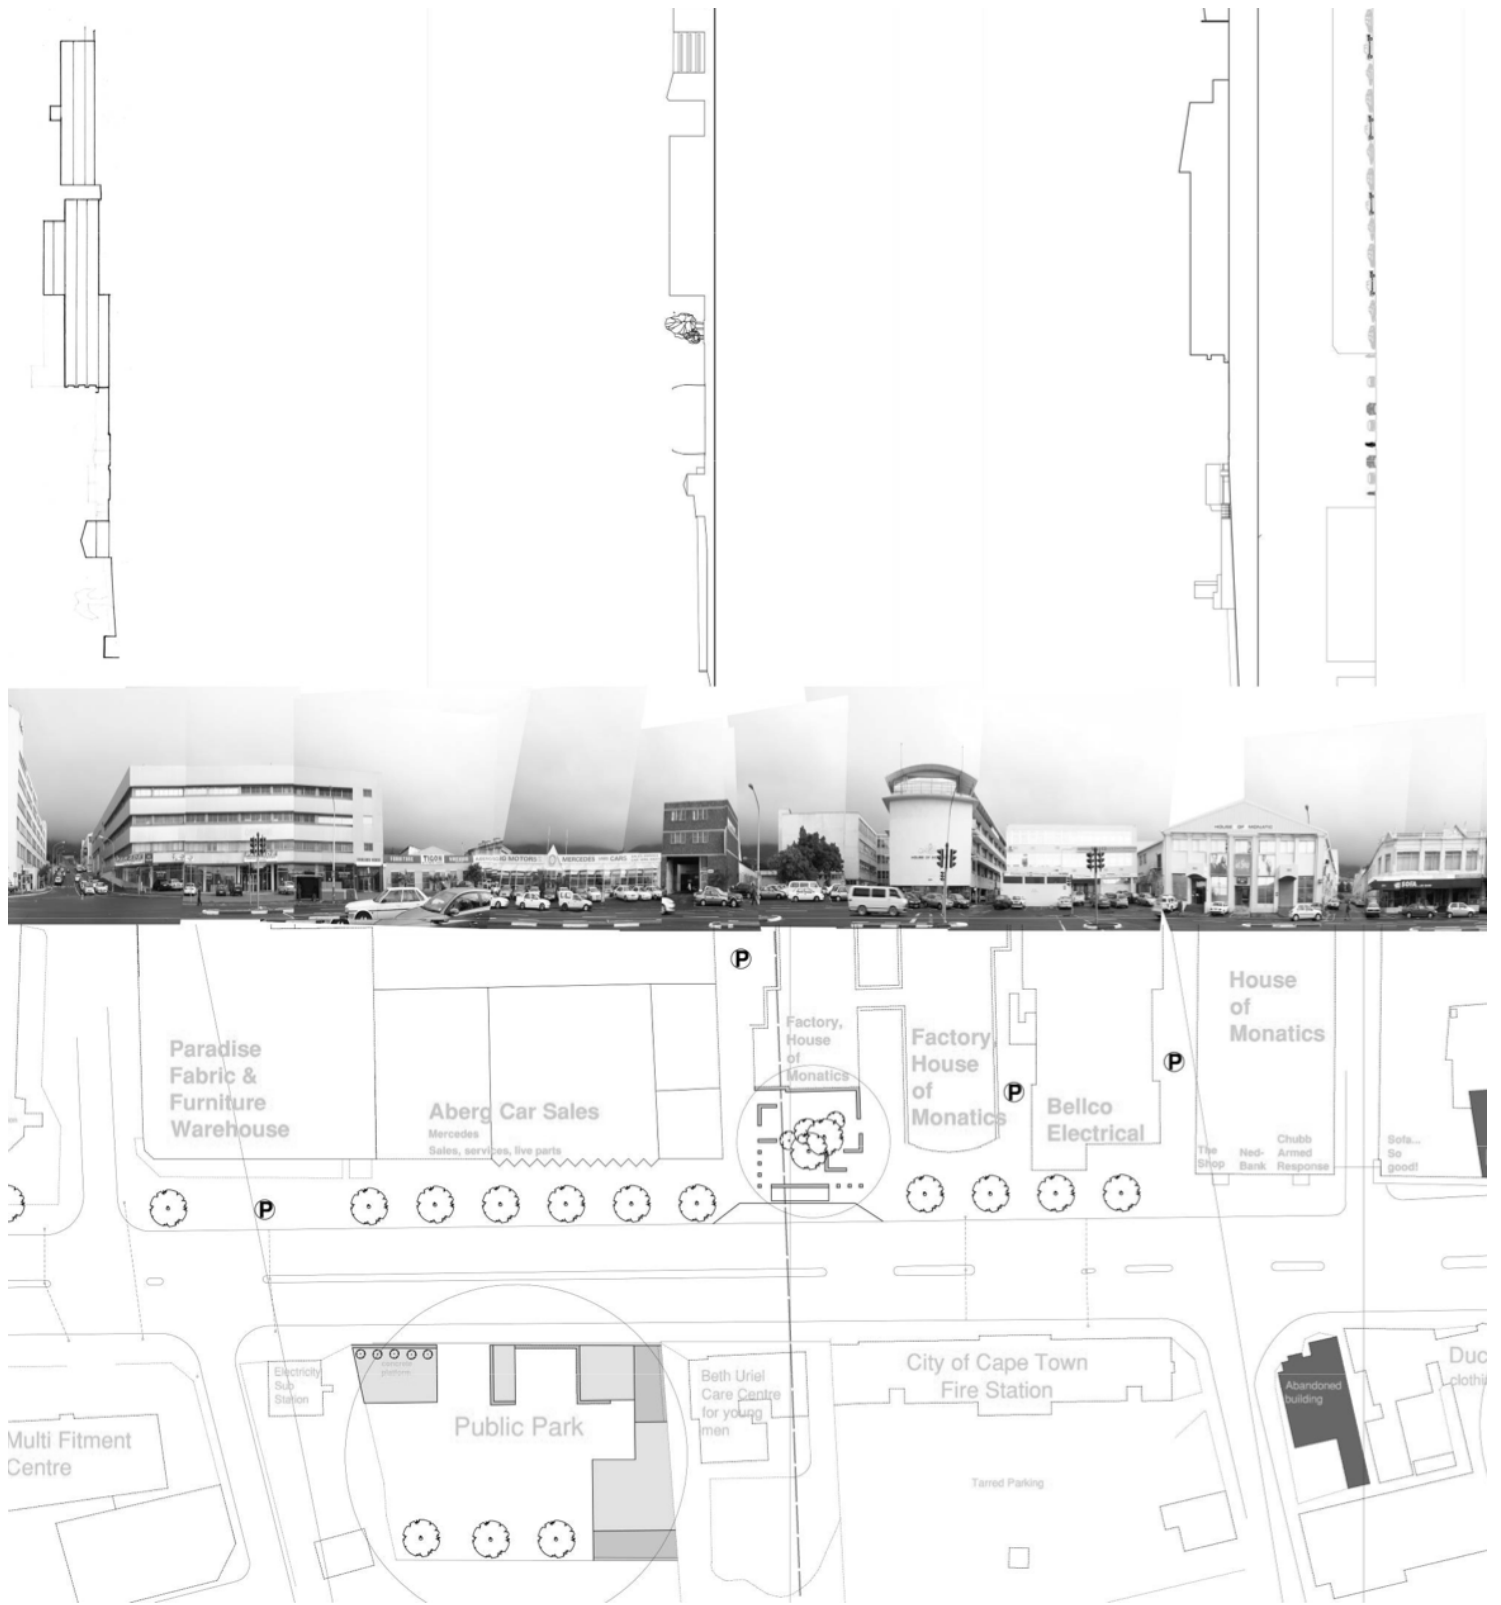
Student work 2007. Photographic Street Elevations, Main Road Salt River/Woodstock.
